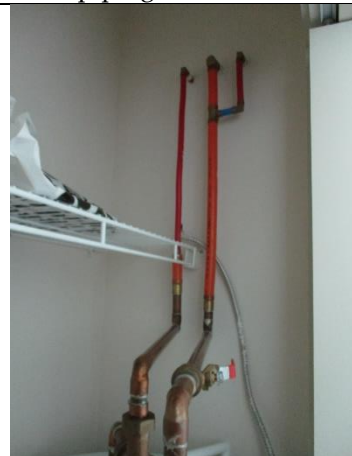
Kitec® piping connecting to hot water tank serving amenity spaces on roof level.
